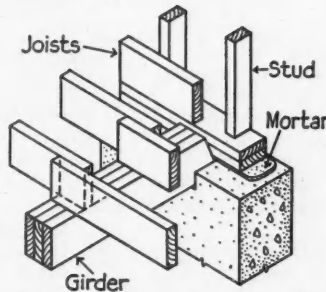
FRAMING JOIST ON TOP OF GIRDER
